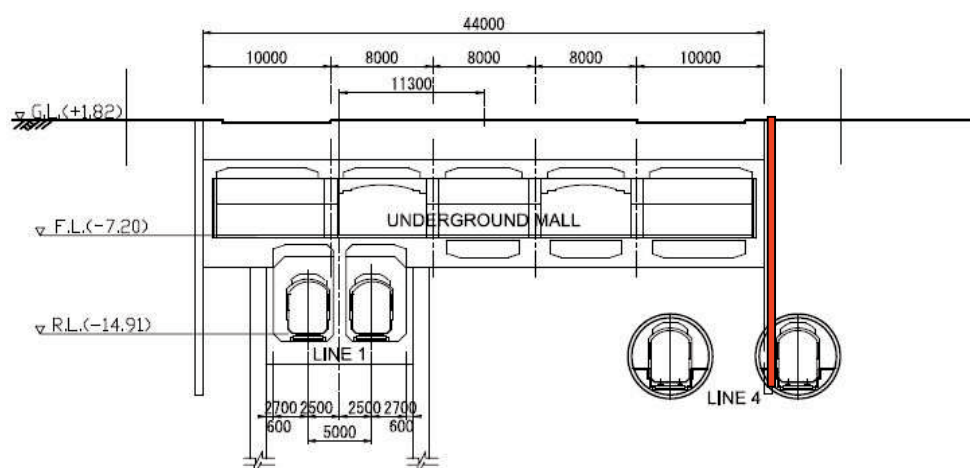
Cross Section with Retaining Walls of USM and Line 4 Tunnels
